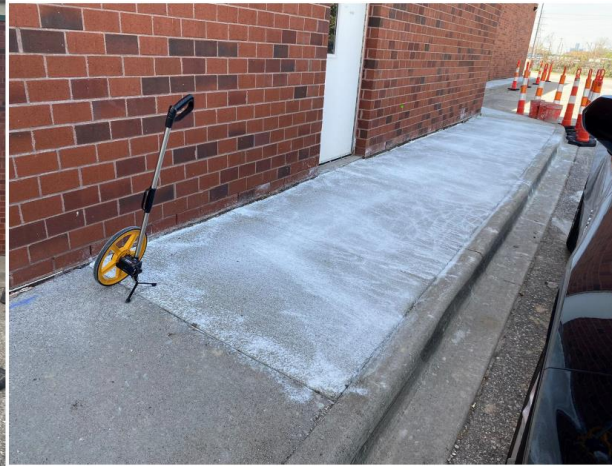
Portion of sidewalk replaced at north elevation. The concrete was poured on May 9<sup>th</sup>.
